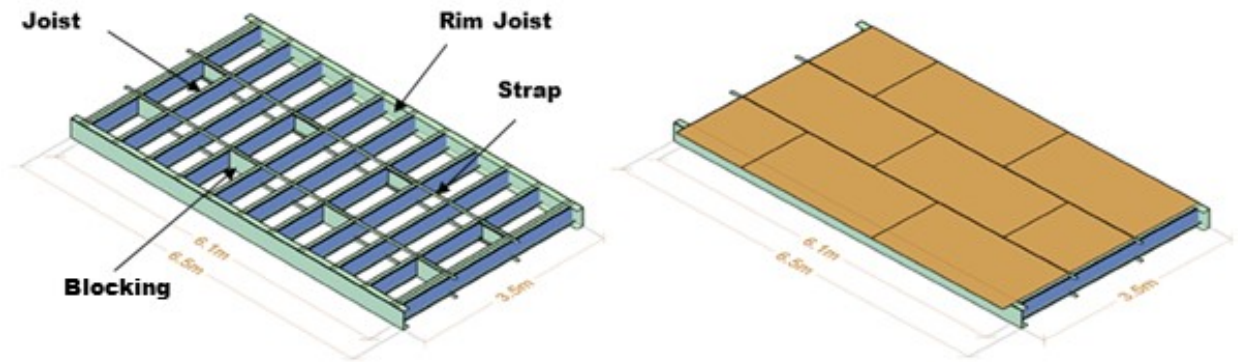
Bare Frame and Frame with Sheathing: Specimen 12-RSTRAP-M
